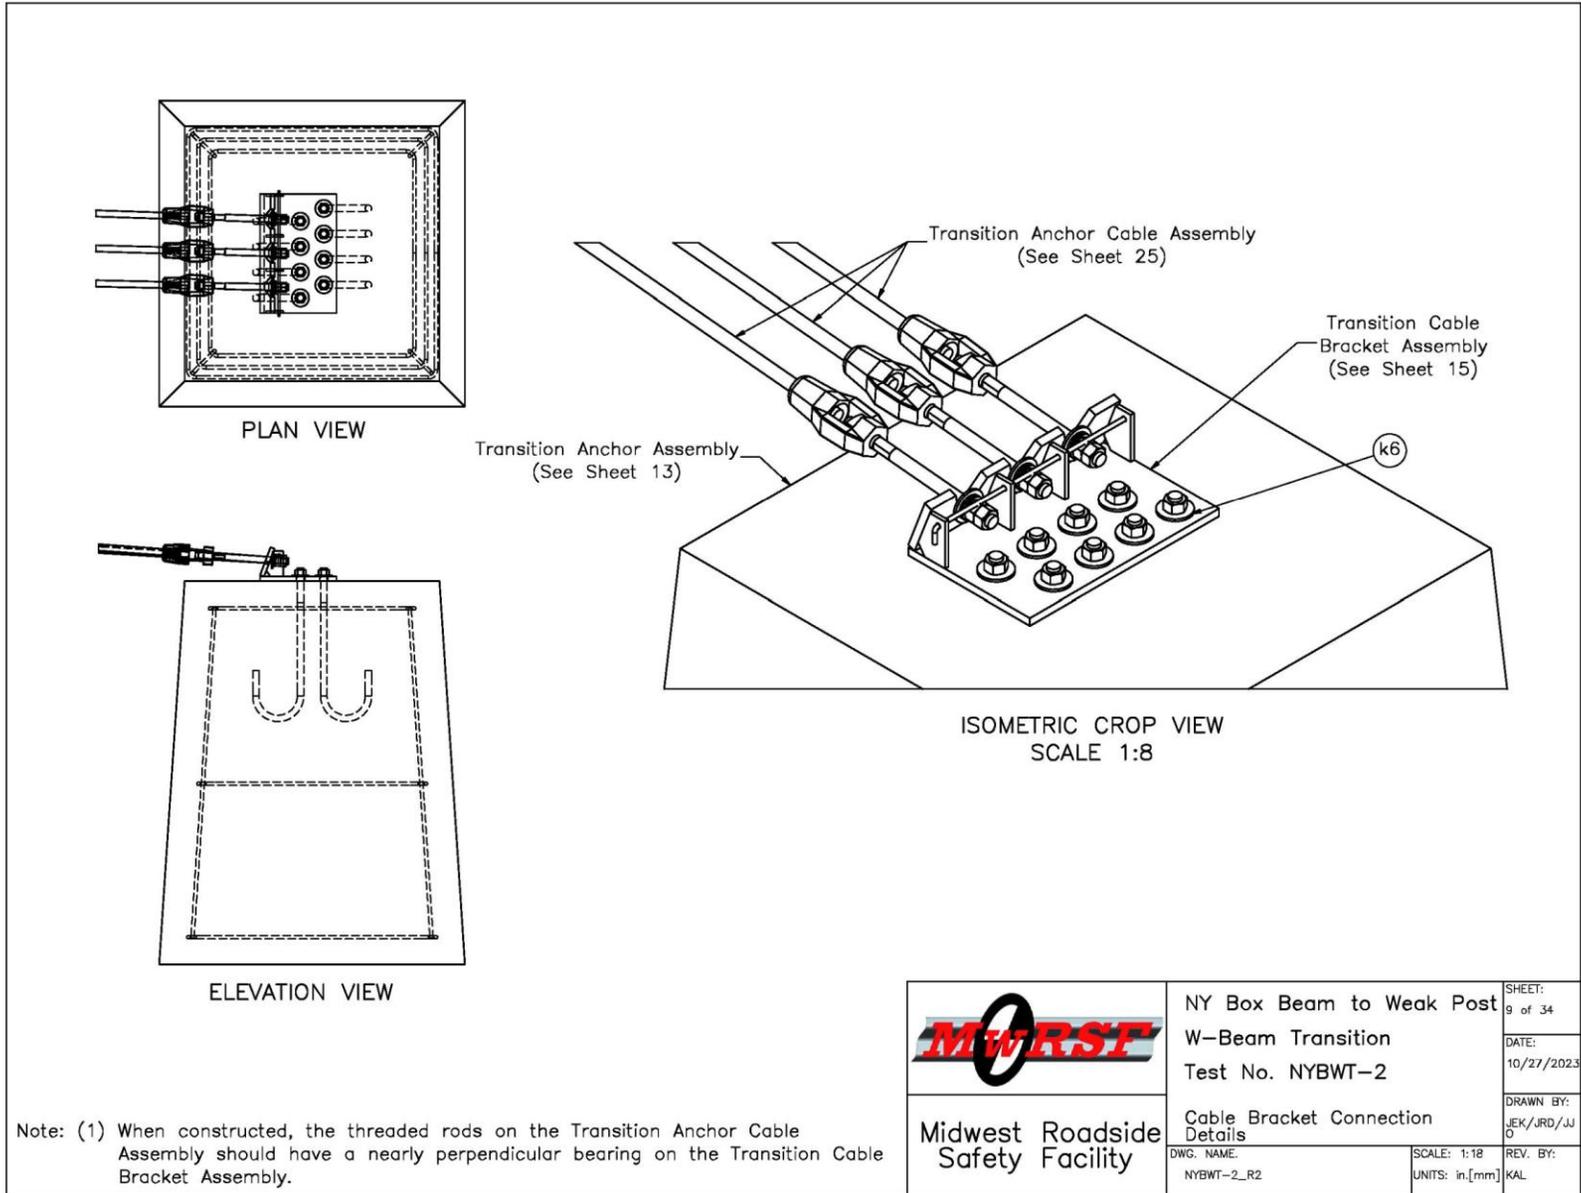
Cable Bracket Connection Details, Test No. NYBWT-2
